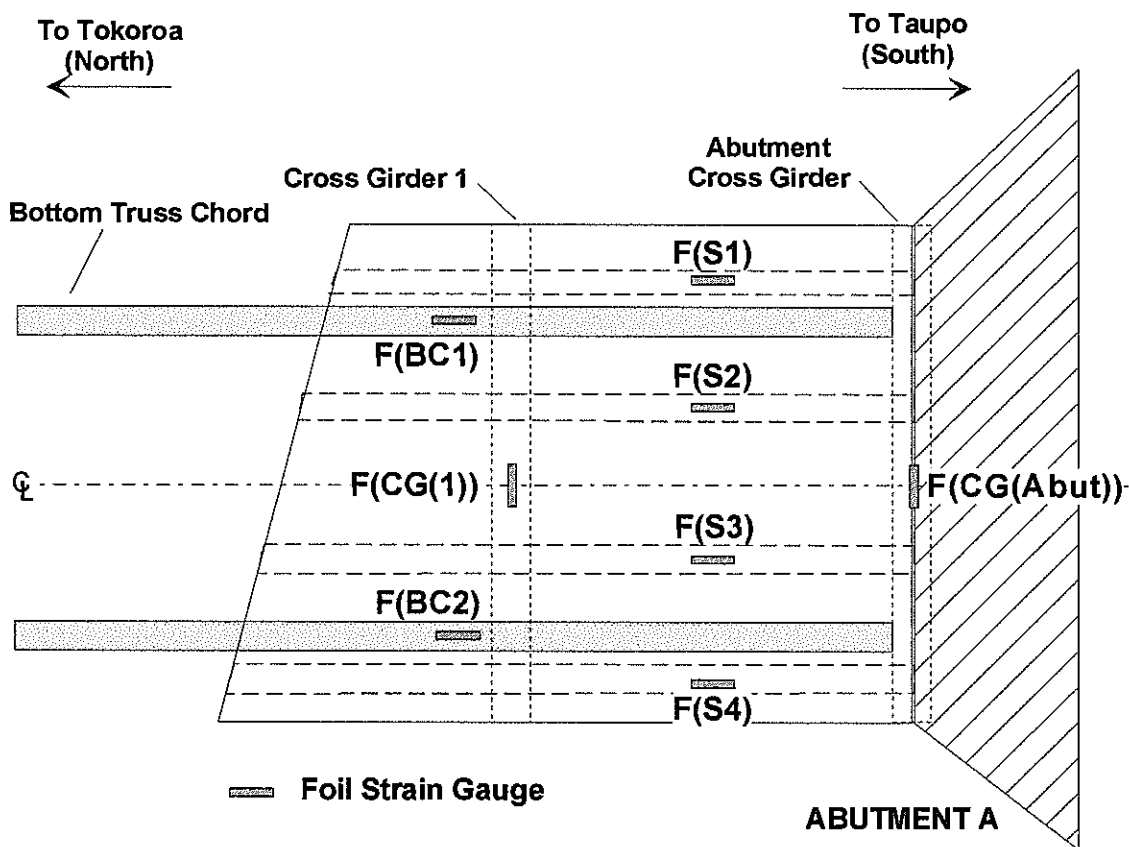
Instrumentation plan for Atiamuri Bridge.
